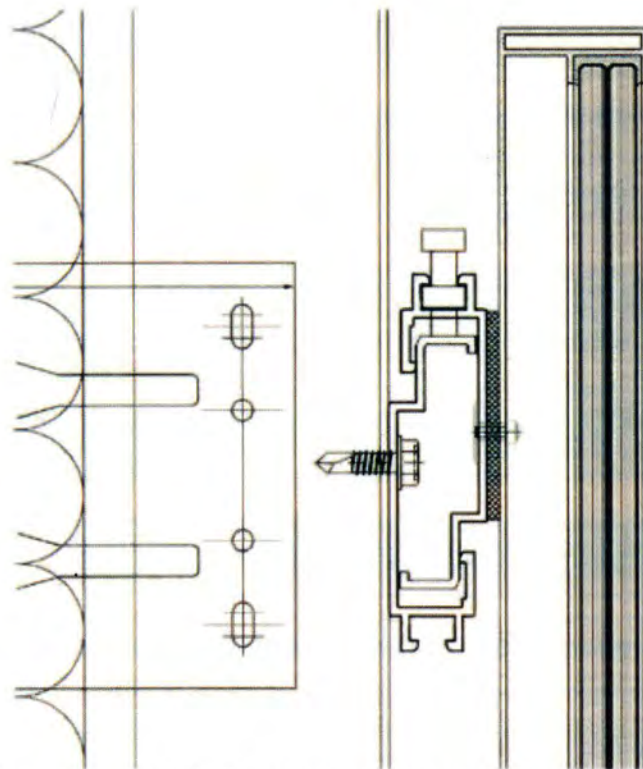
Details of test elements – detail: mounting of photovoltaic module with a frame
